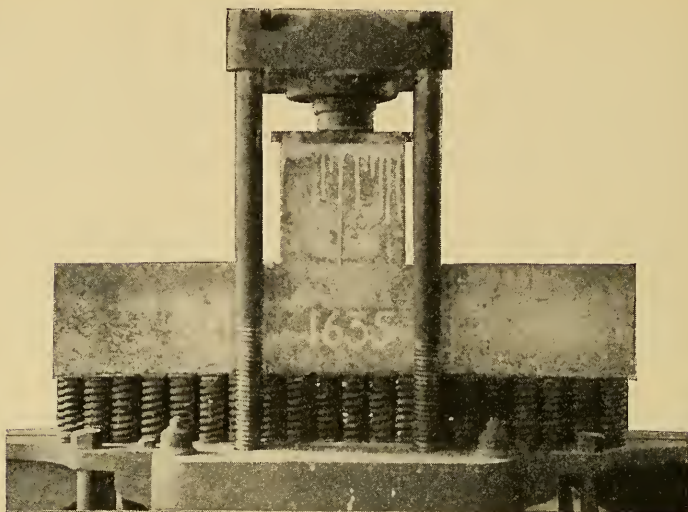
VIEW OF WALL FOOTING IN TESTING MACHINE.
